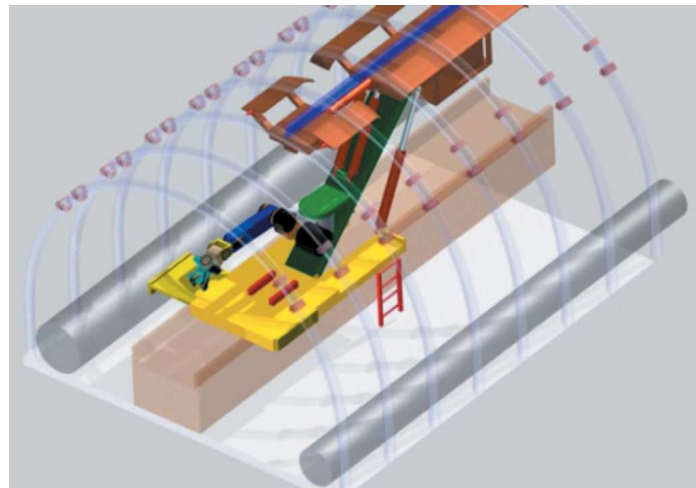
Concept of working platform with manipulator for final assembly of steel arc lining LP [6]
